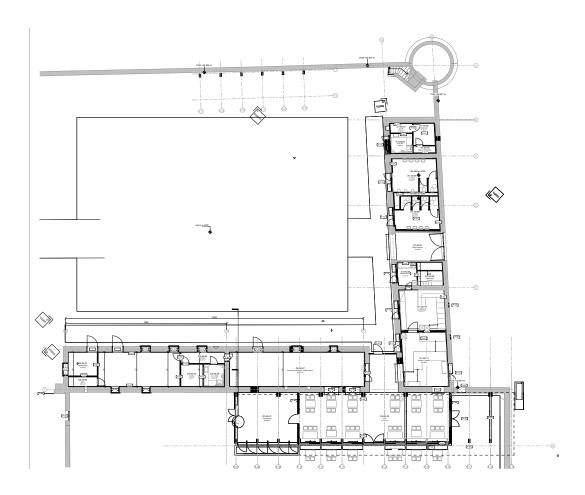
Proposed GA Ground Floor Plan Stables by Metropolitan Workshop
